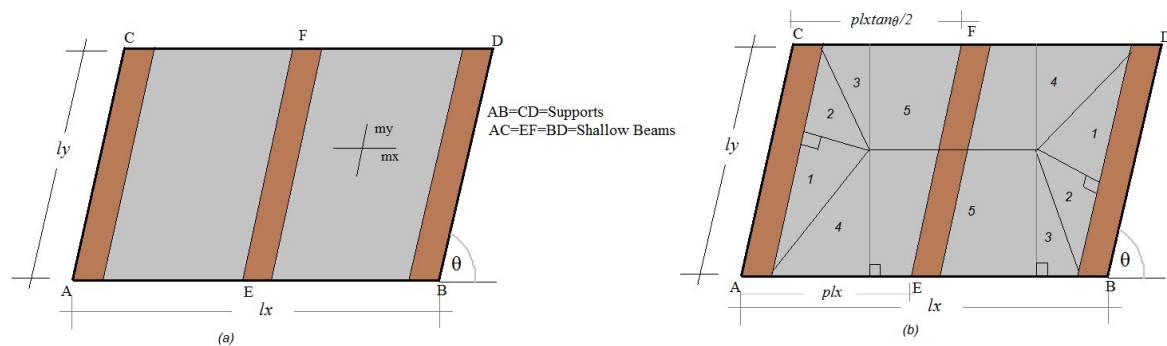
Schematic diagram of skew slab a) Proposed model of skew slab b) Yield line pattern of skew slab stiffened with in-built beams
